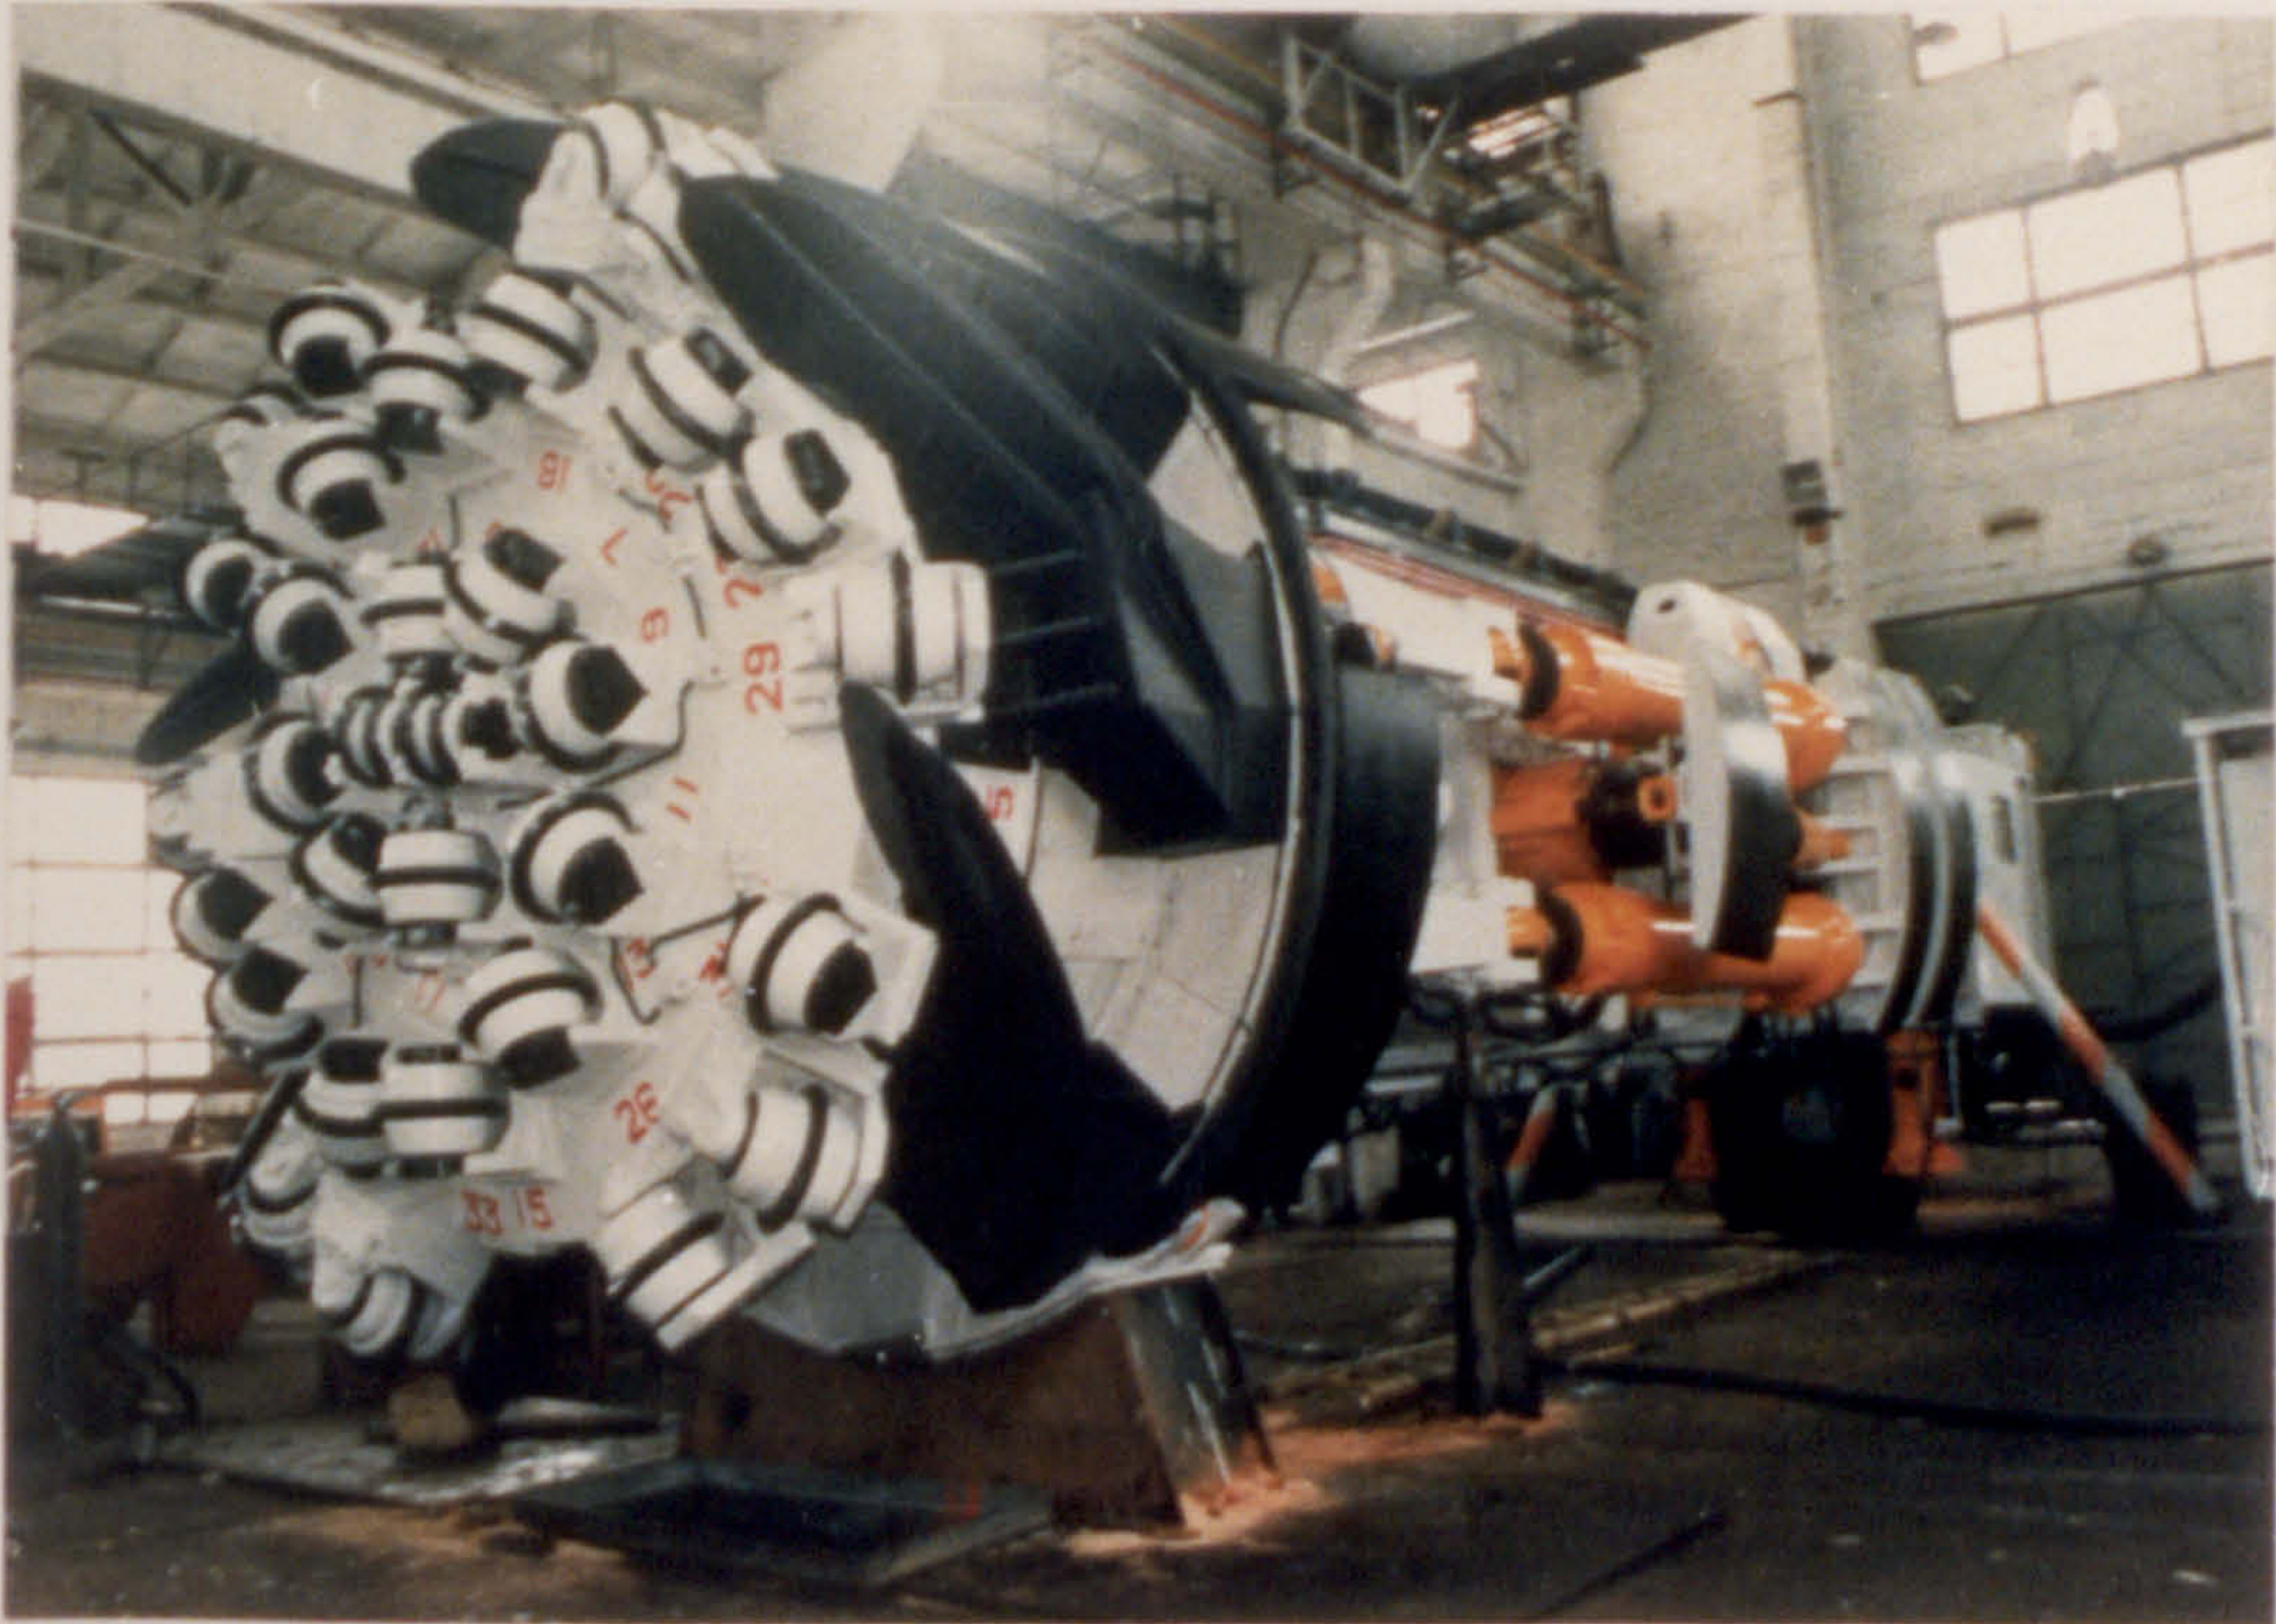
A hard rock full-face tunnel boring machine (TBM)
